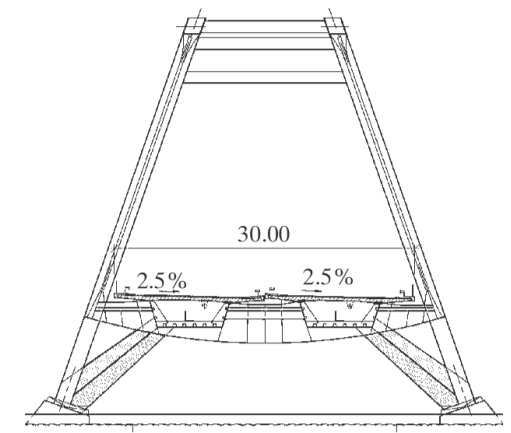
B- Bridge over River Saale (Glitsch) Cross Section I: 750
